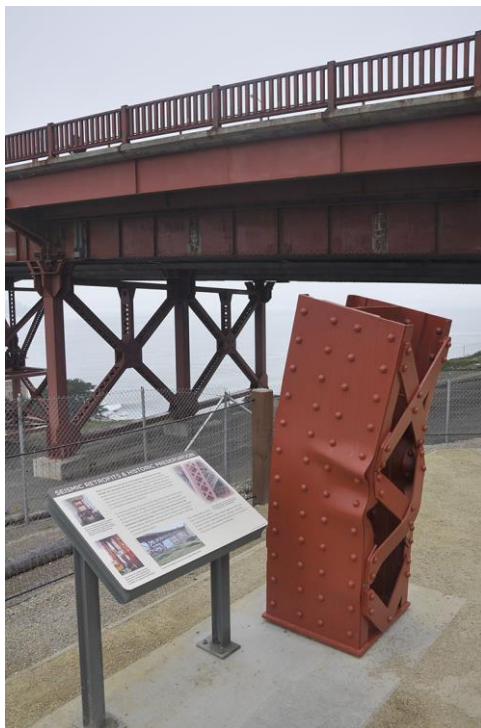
Golden Gate Bridge Strut Exhibit (structural specimen and photograph of test apparatus courtesy of Prof. Hassan Astaneh-Asl, U.C. Berkeley)
